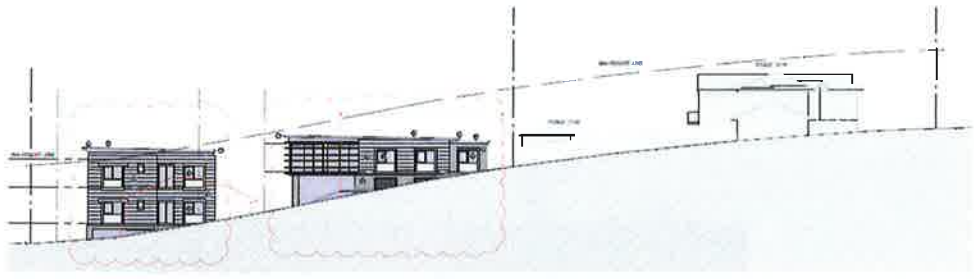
Locksley Street elevation noting that the built form in the middle of the site is not shown in this elevation (Source: MDP Architects)
